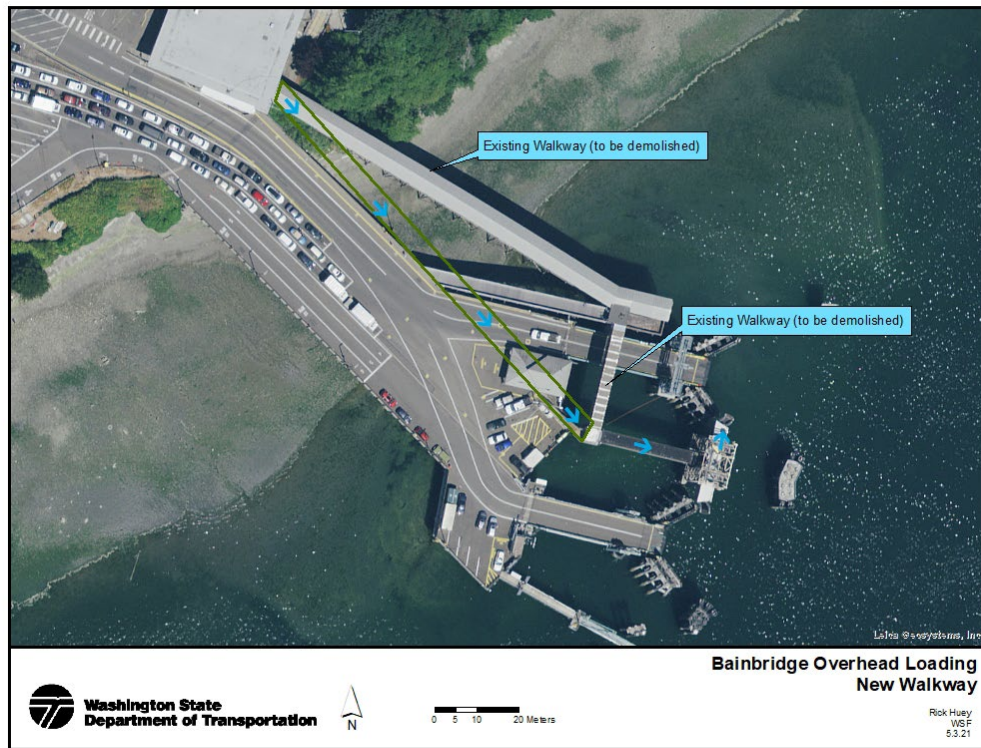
Bainbridge Overhead Loading Permanent Project Elements
